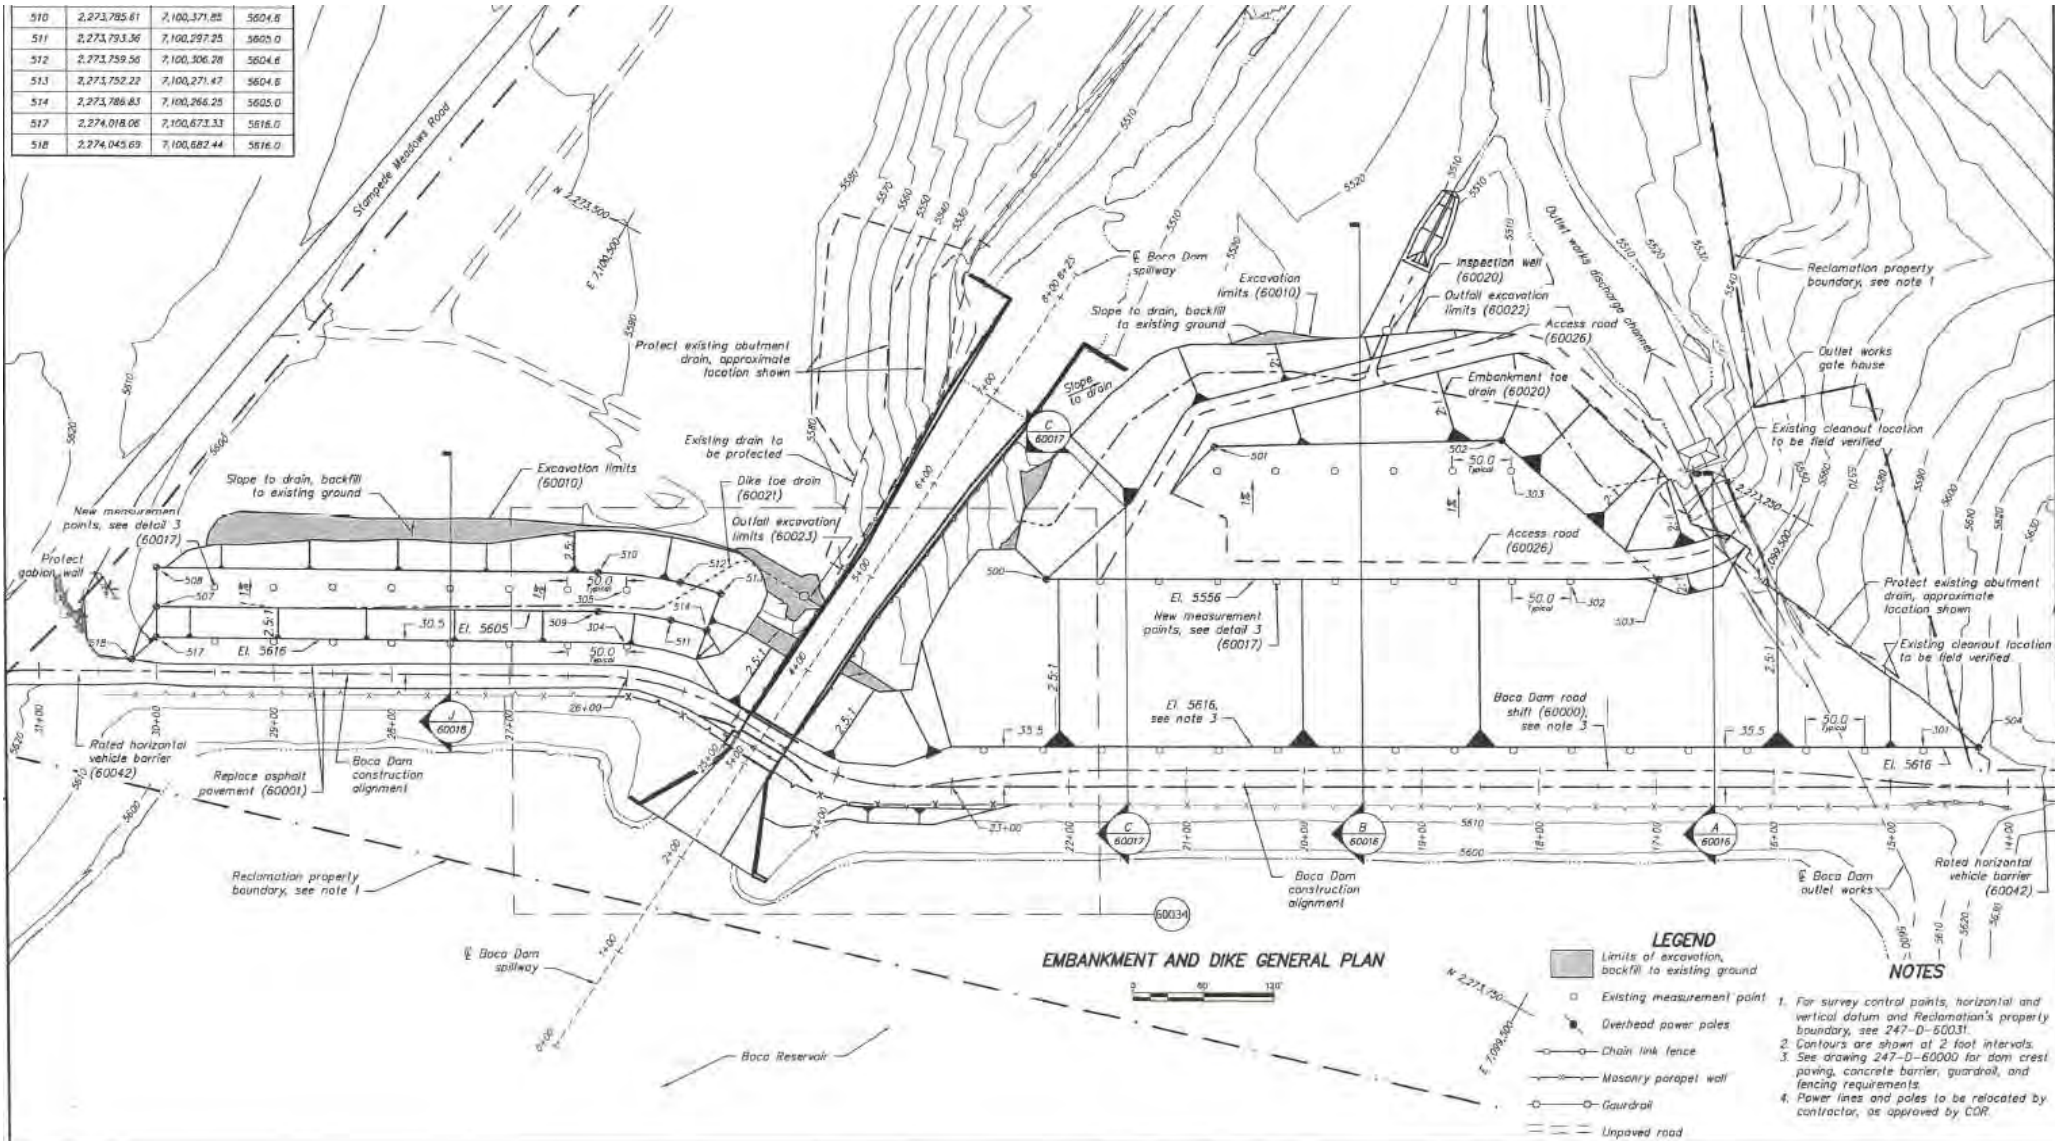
Proposed Action Alternative stability berm conceptual plan view
